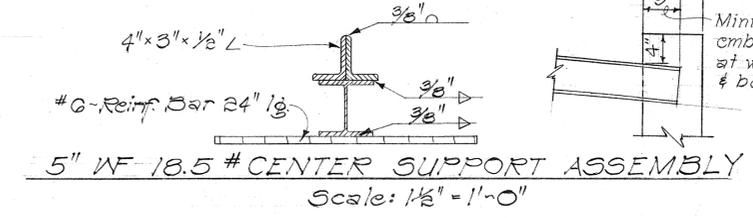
DETAIL OF REINFORCED CONCRETE BEAM CENTER SUPPORT
